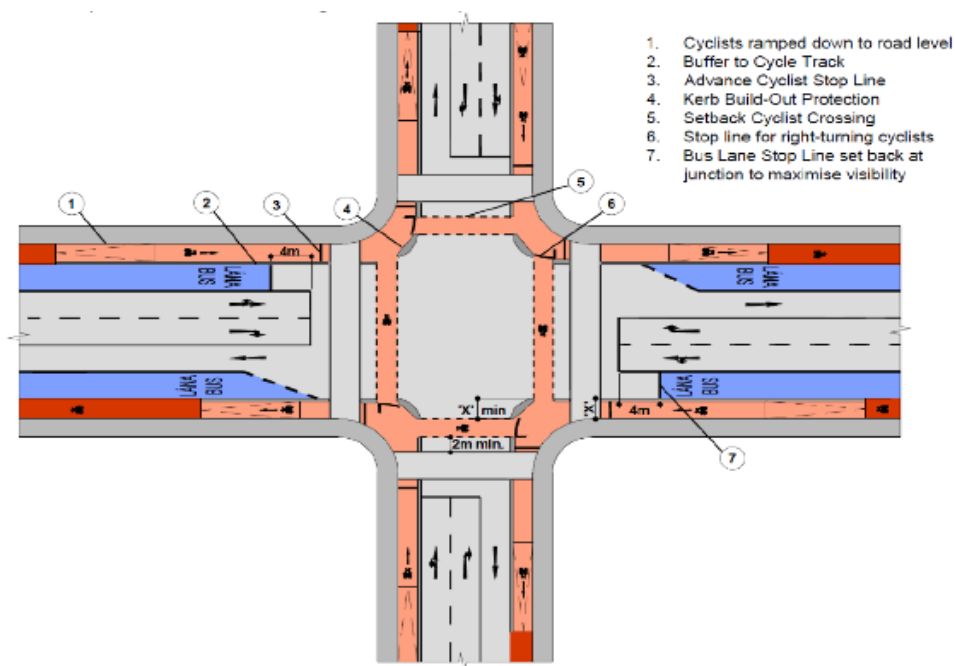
Typical Junction Layout from BusConnects Design Guidance Booklet
